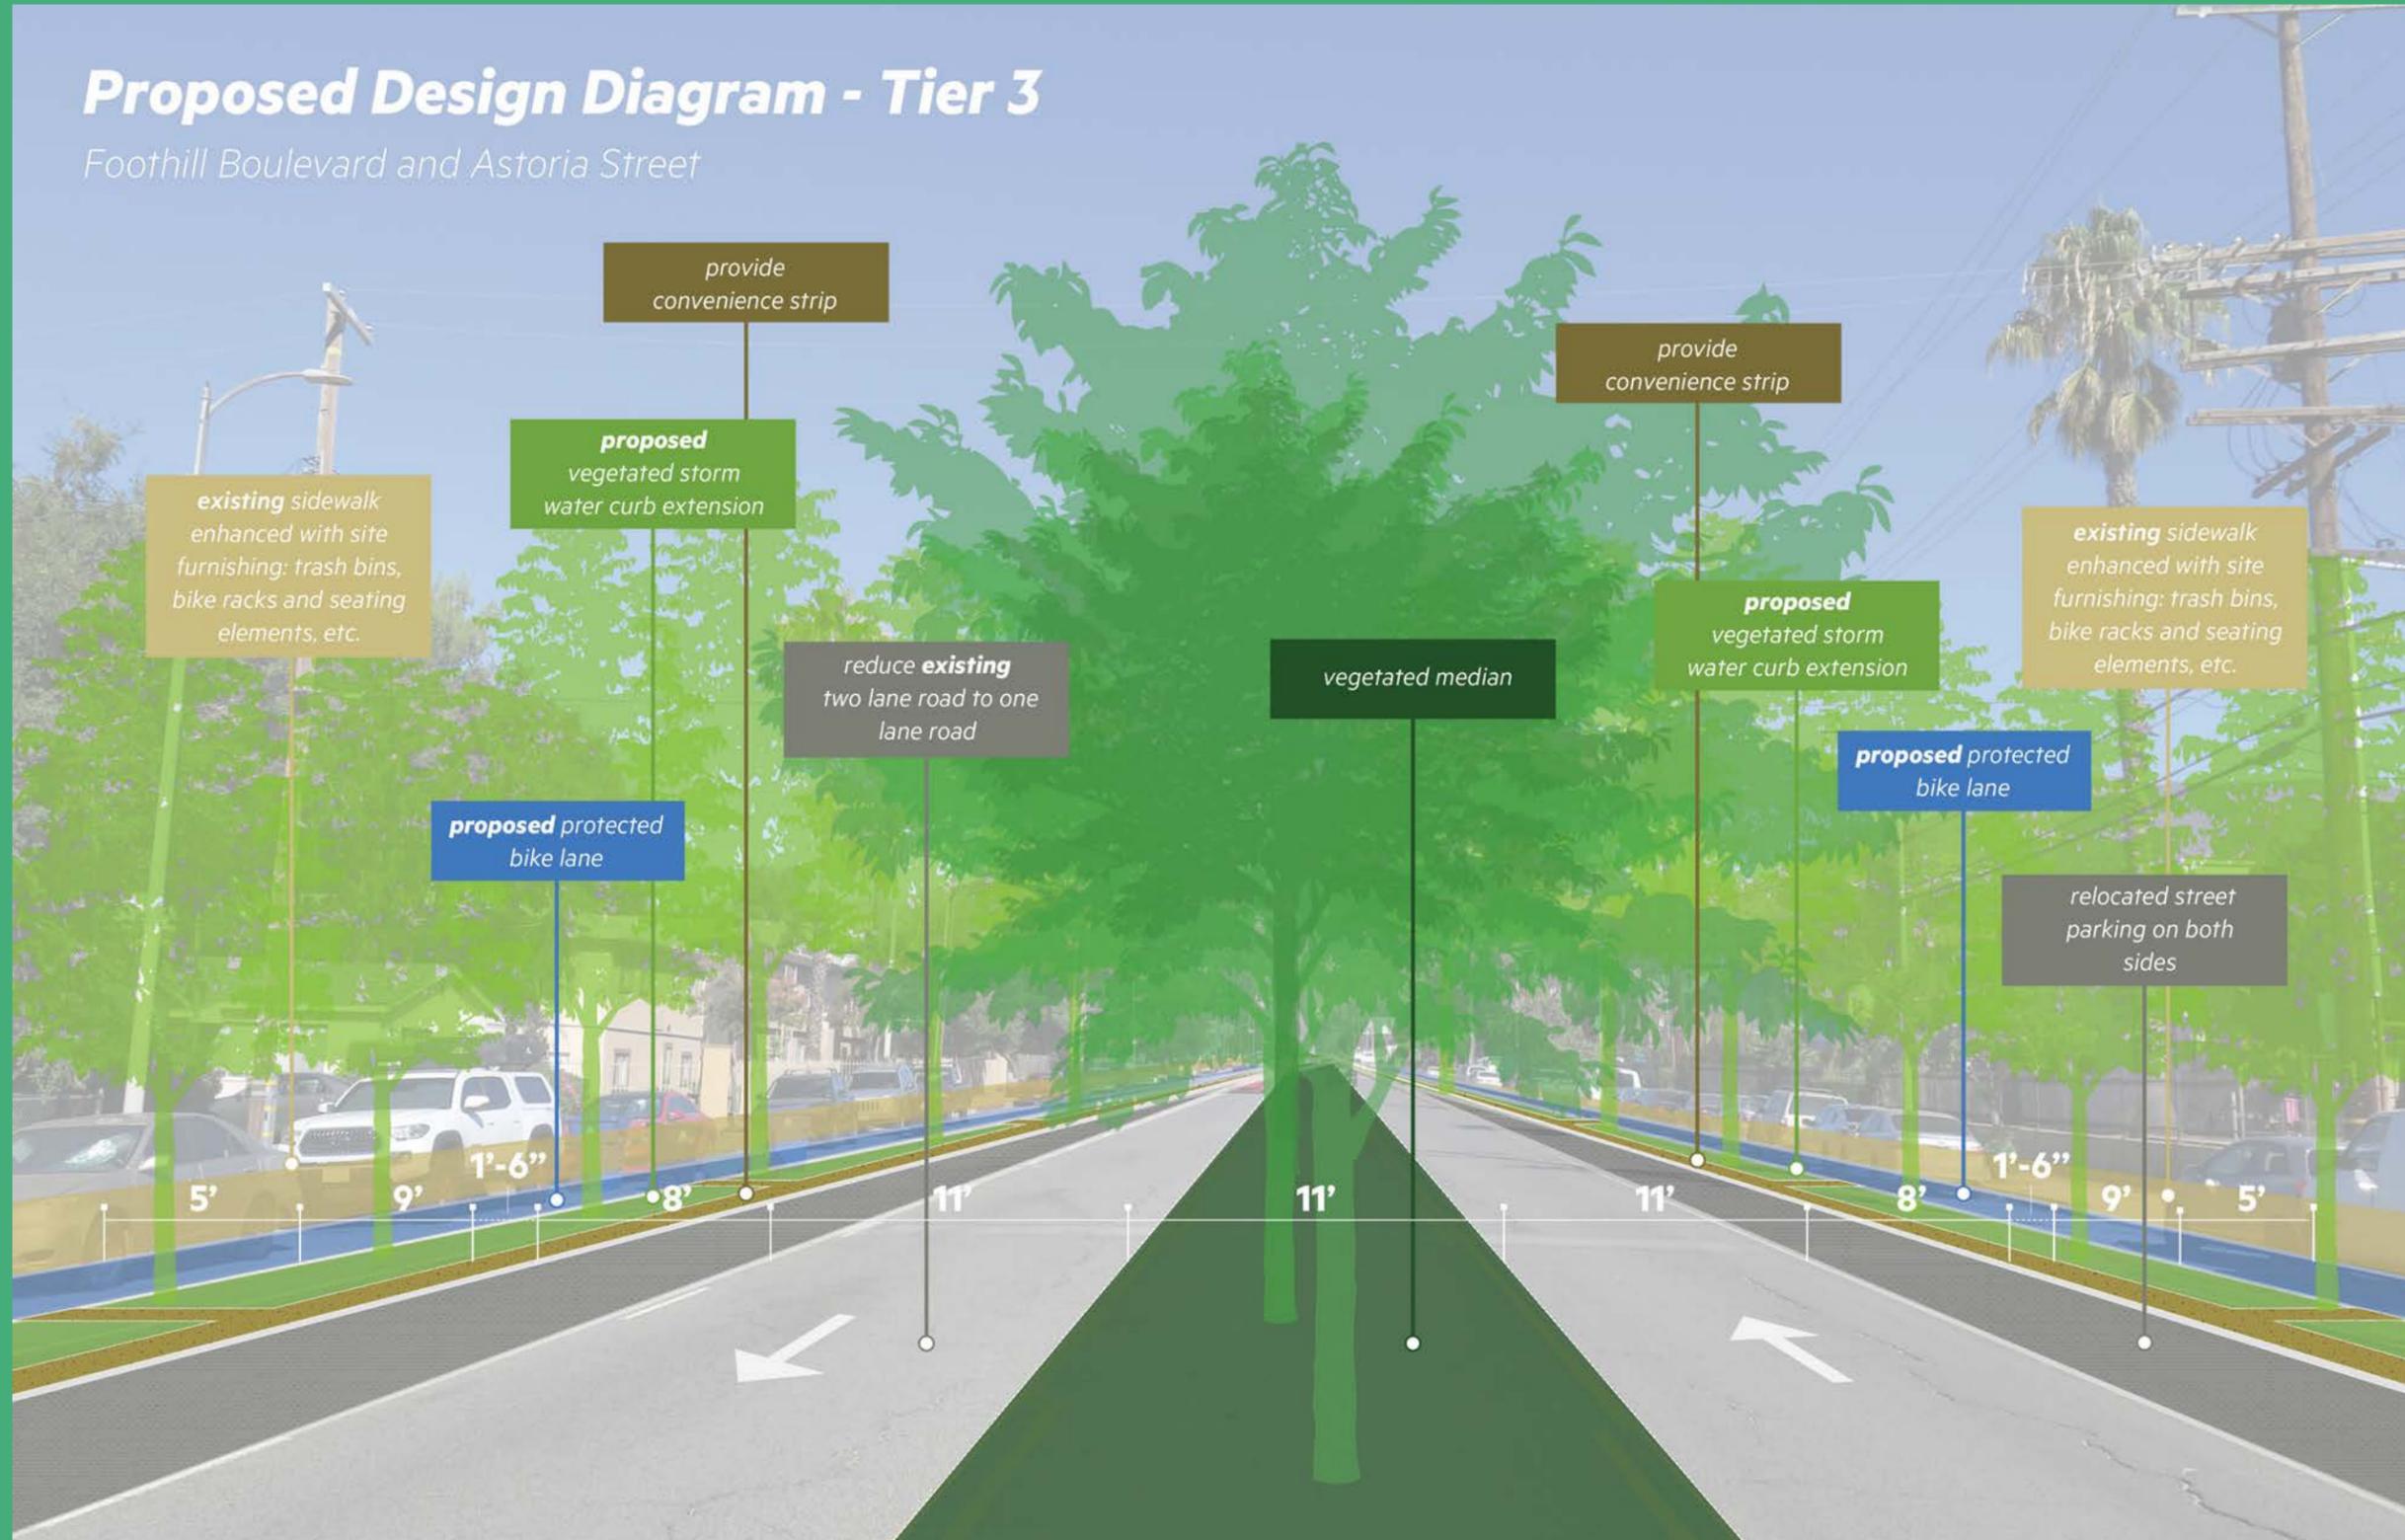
Foothill Boulevard and Astoria Street, proposed design diagram, Tier 3
